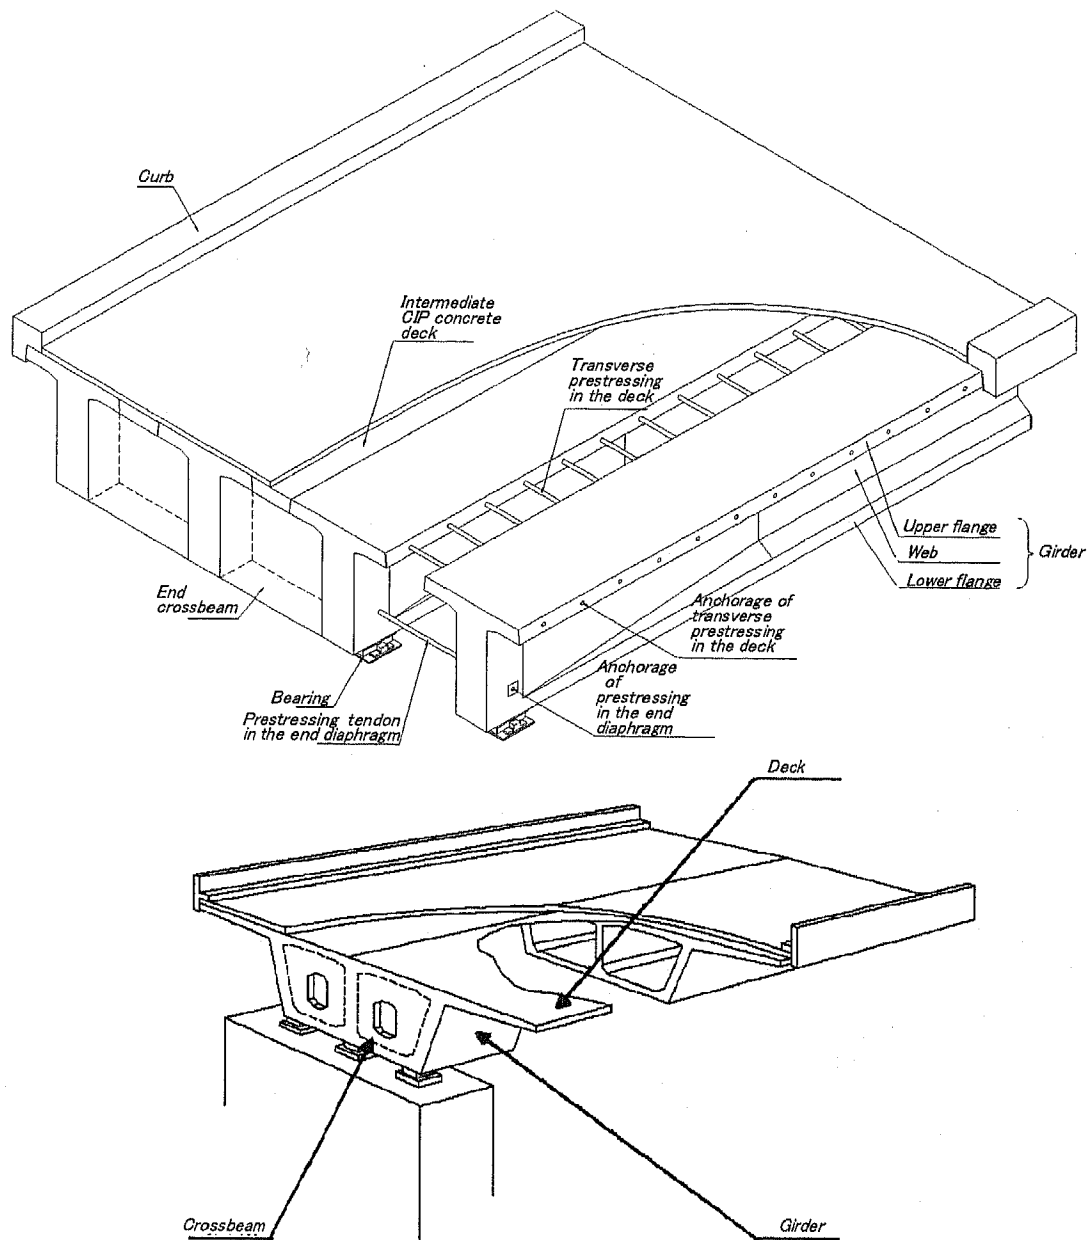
Typical members of concrete bridge (above: PC-T shaped girder, below PC box girder)
